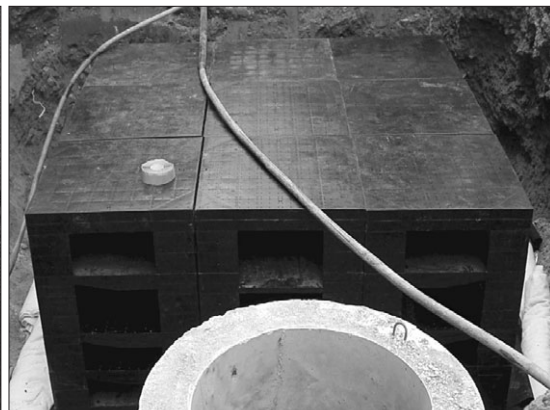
Roof and plastic rainwater facility with concrete manhole for study at 2nd housing complex completed in 2006
